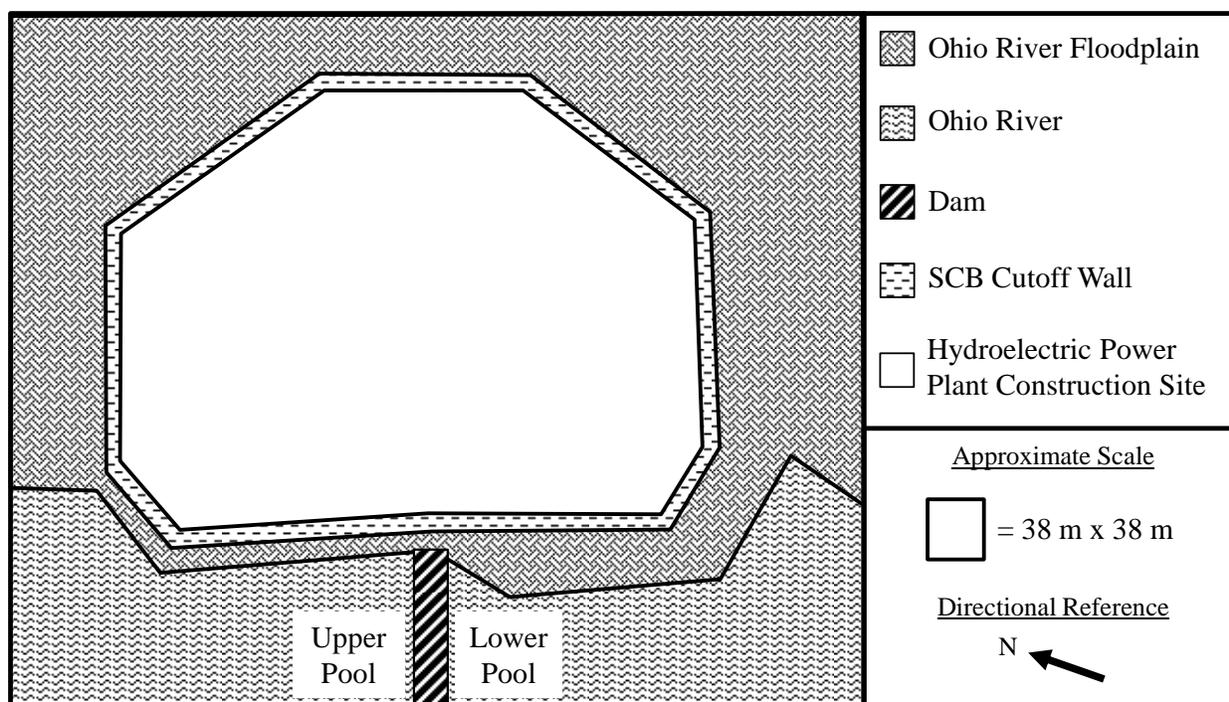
Plan View of Smithland Cutoff Wall (SCB Cutoff Wall width not to scale)
